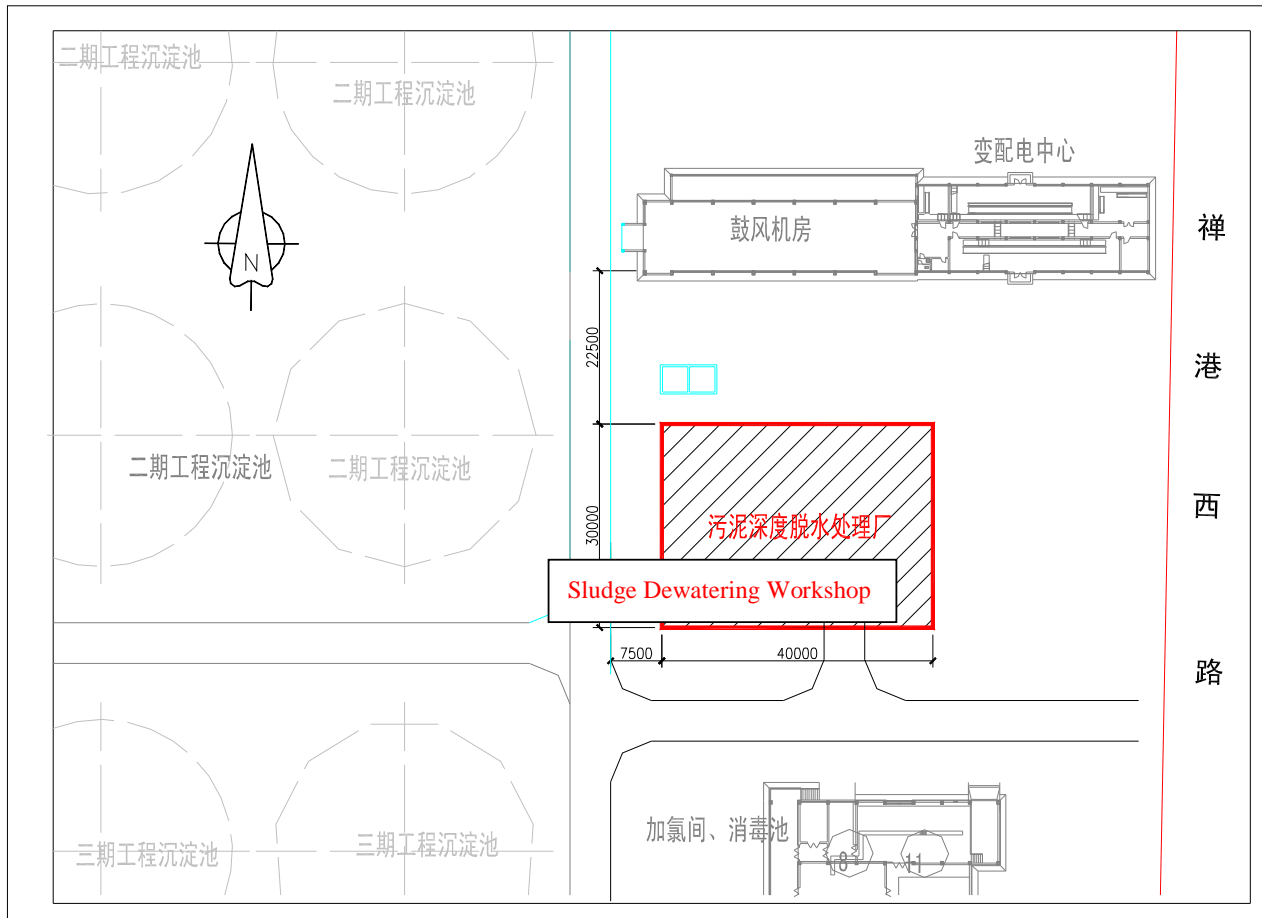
Site Location of Nanzhuang WWTP Sludge Dewatering Workshop Scale 1:900
